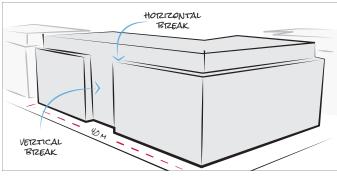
Buildings over 40m in length should incorporate a significant horizontal and vertical break in the facade (4.1.2 c).
